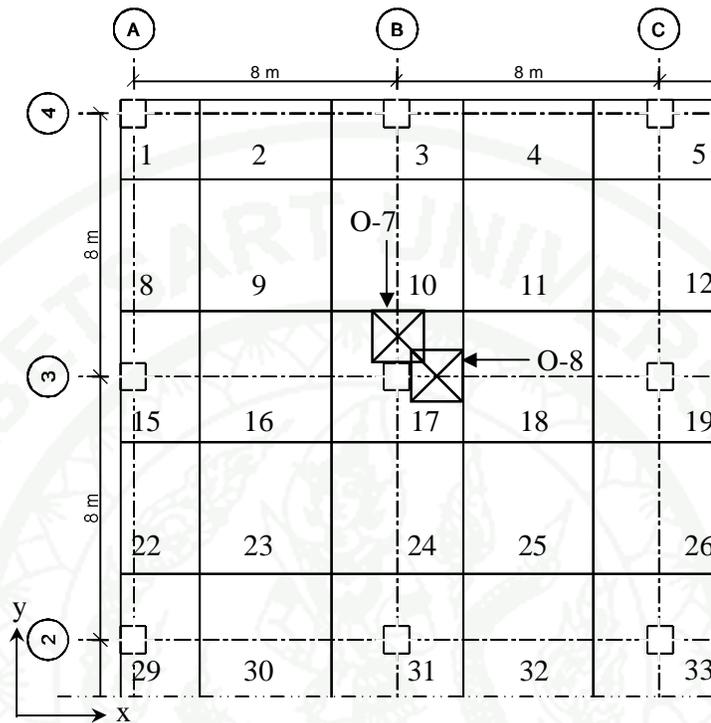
Flat plate model with openings at the area common to intersecting column strips [O-7 and O-8]
